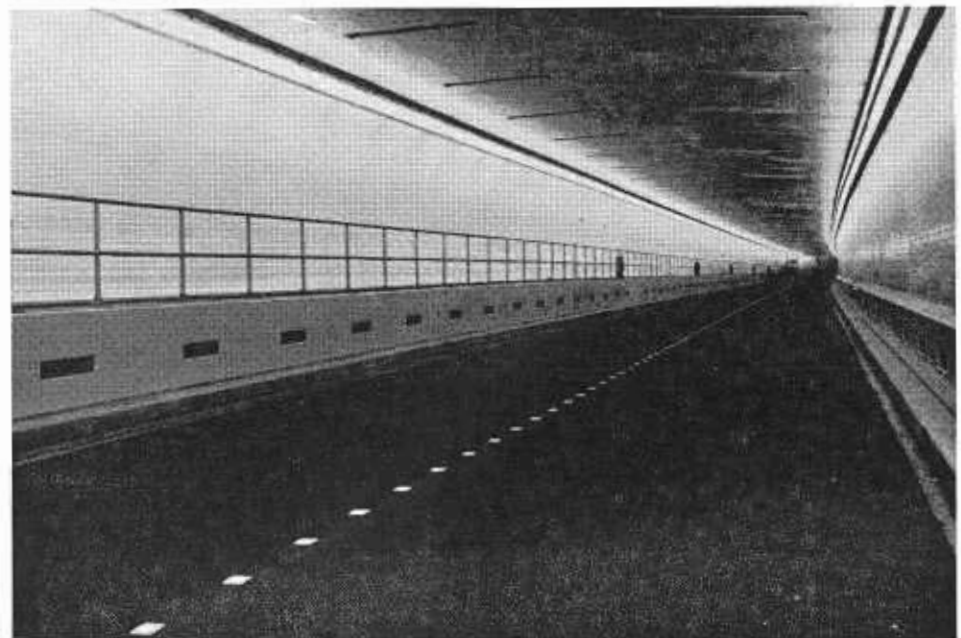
Two-way wedges, white nonbeaded, on the roadway of the Webster Street Tube.
